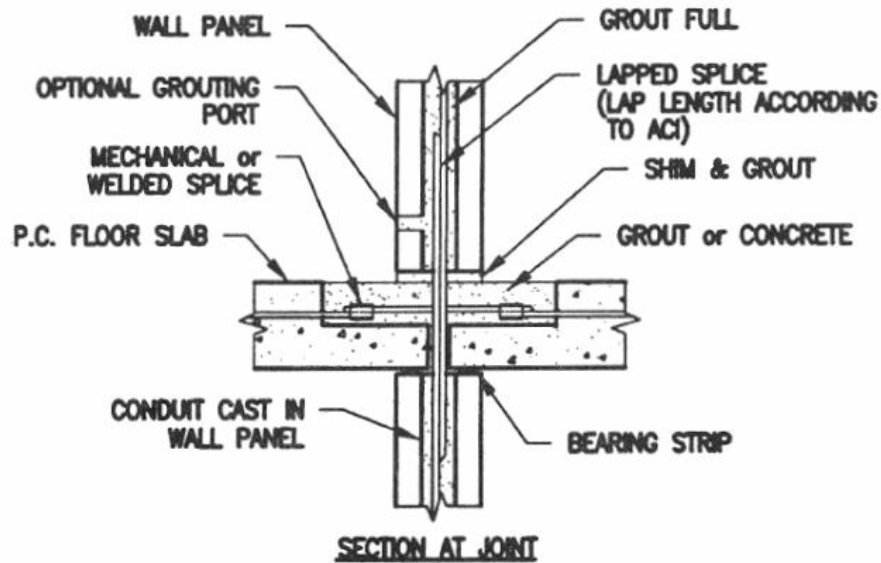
Detail to Join Wall Panels Vertically Using Large Conduit (ACI 550, 2001)
